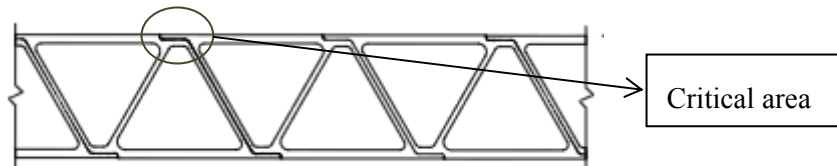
Component level connection made of adhesive bonding of ASSET deck
